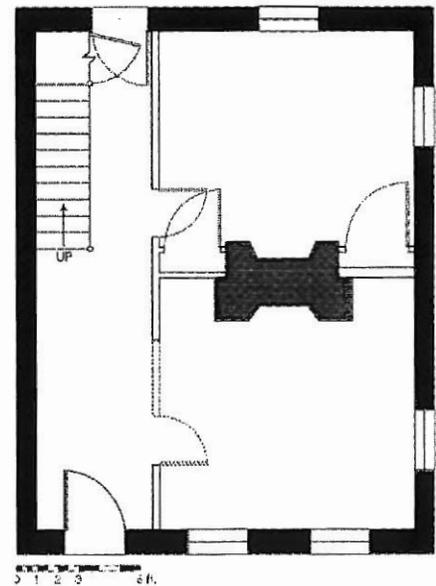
126 Harmony Street, New Castle, DE, Ground Floor Plan
